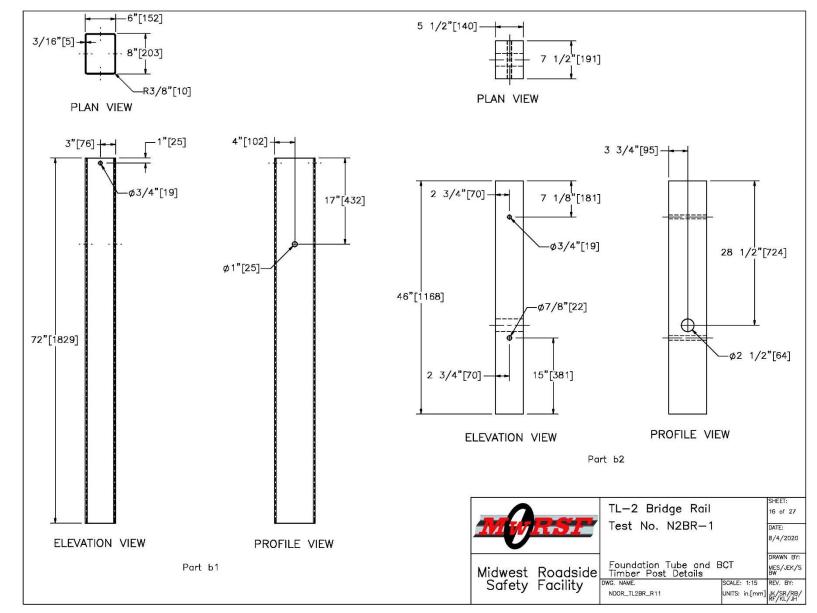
Foundation Tube and BCT Timber Post Details, Test No. N2BR-1
